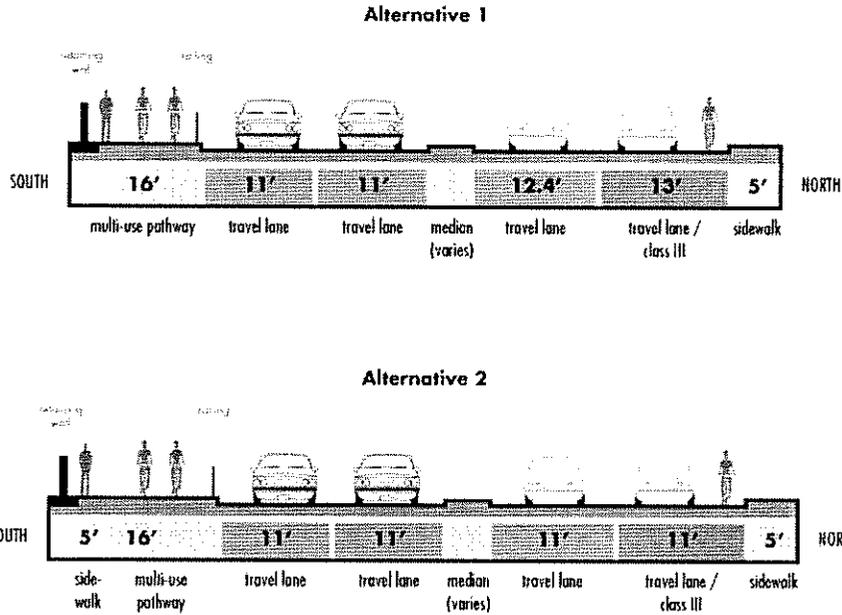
Section of Proposed Improvements for Project 12: Second Street (Section B: East of Ida Street Intersection) (Medium-Term Improvement)
